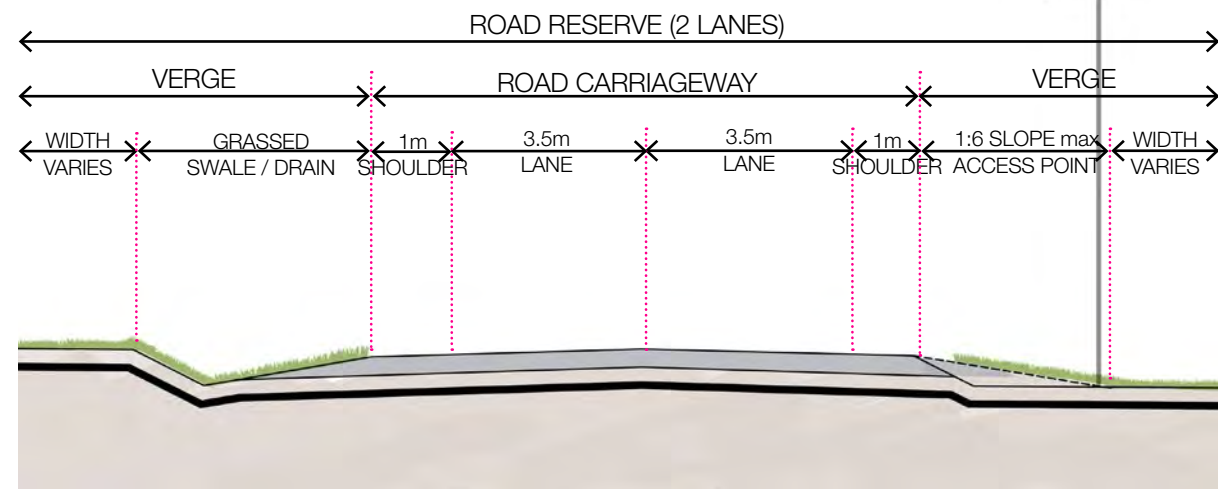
Typical cross section for arterial roads in rural / transition setting
